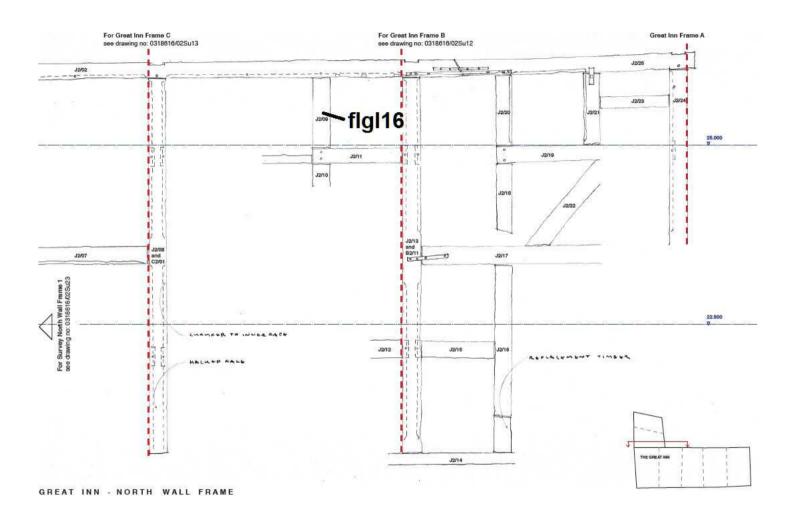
Drawing of the north wall of the main range, showing the timber sampled (after Butler Hegarty Architects)
